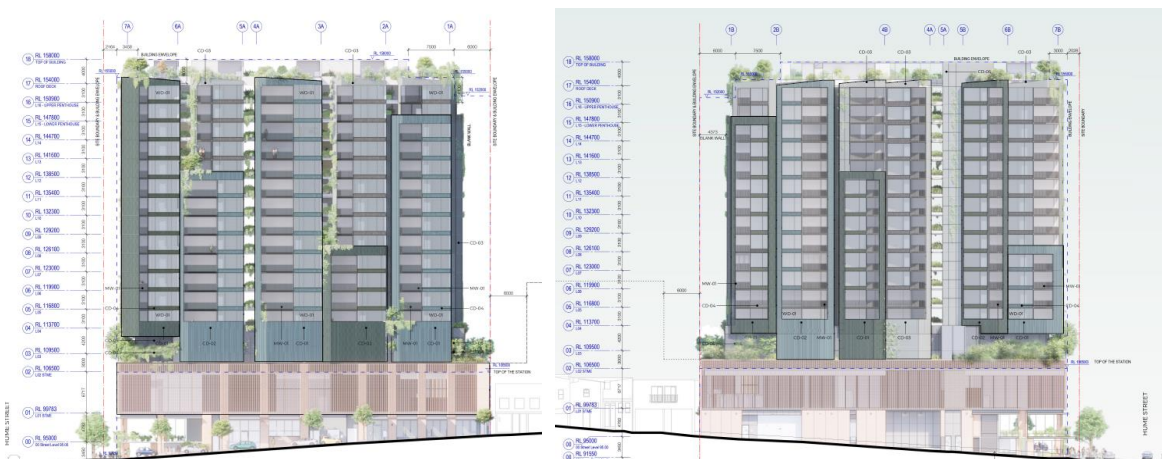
South-west Pacific Hwy elevation (L), North-east Clarke Lane elevation ®
